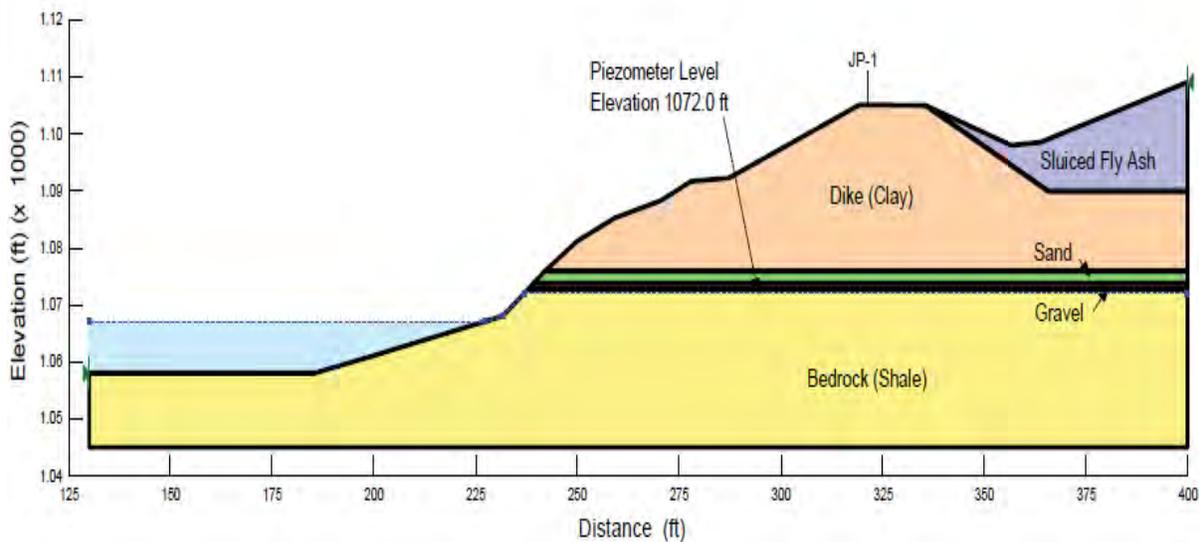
Typical Ash Disposal Area J Cross Section (East)
